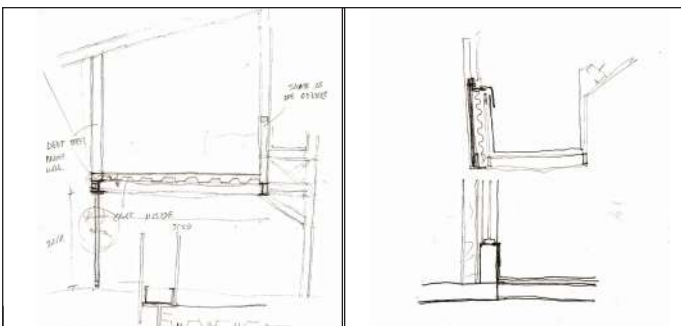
Gym mezzanine floor detailing and window detailing (Author: 2019)
